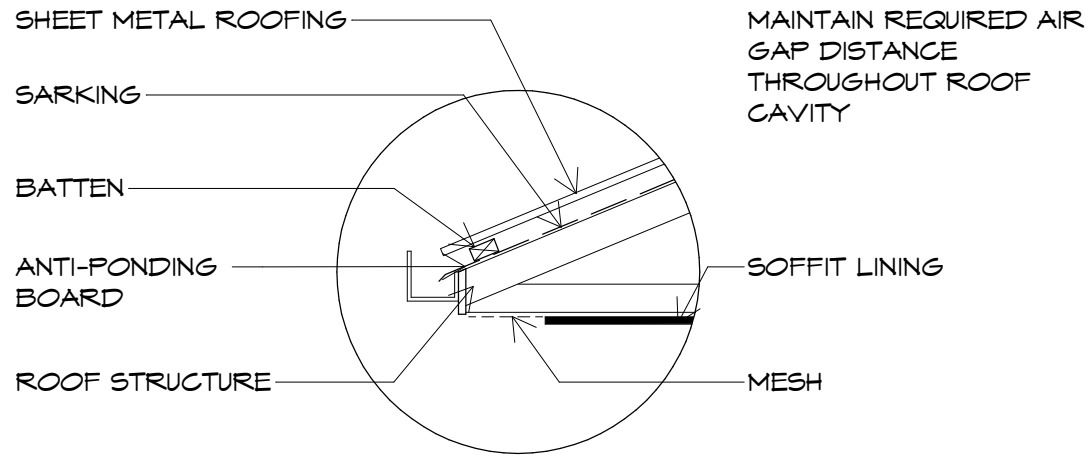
EAVED ROOF WITH BUSHFIRE CONSIDERATIONS SHOWN
